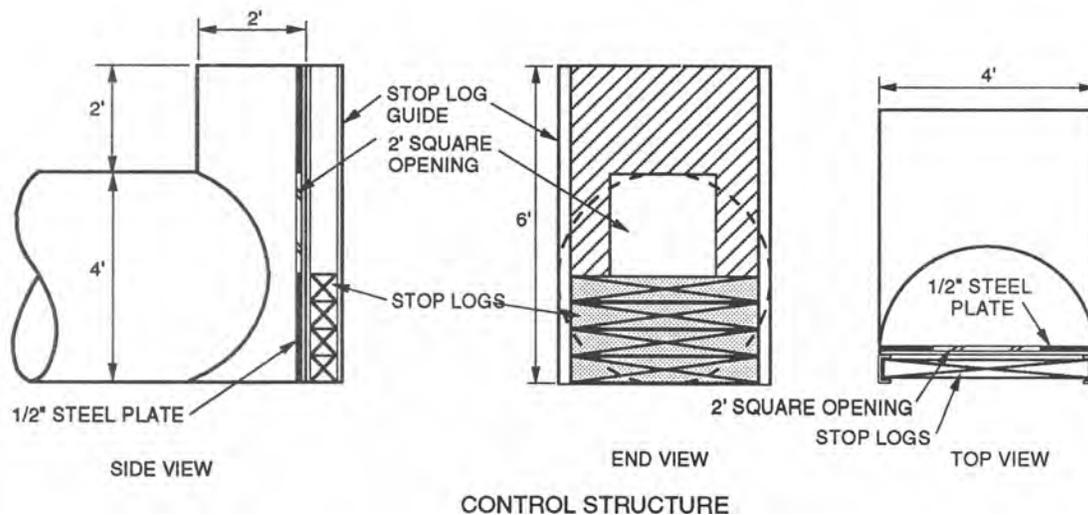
Culvert and controlled entrance to the Rapid City fish passage channel. The gate opening may be adjusted by adding or removing stop logs (drawing Ewashko Consulting).
